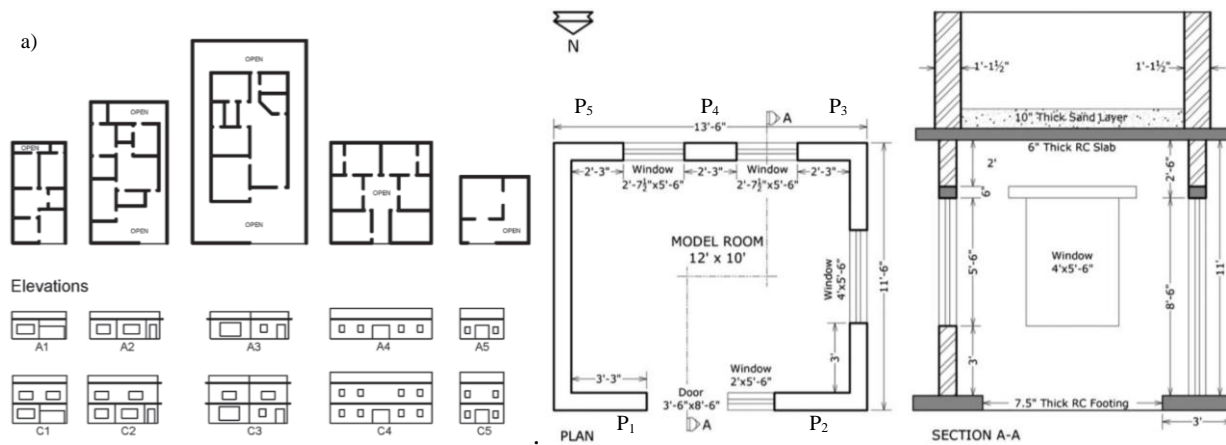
a) floor and front view plans of 5 typologies (Mahmood & Ingham, 2011) b) The plan and front view of the single room representative for URBM building in Northern Pakistan (Shahzada et al., 2012)
